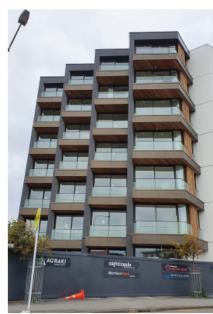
STAGGERED BALCONIES MAXIMISE PRIVACY WHILE RETAINING OUTLOOK AND SUNLIGHT ACCESS (WELLINGTON)
